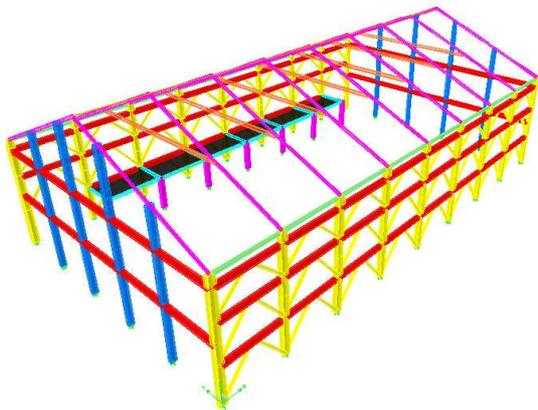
The 3D model of the structure with steel bracing on X-direction
